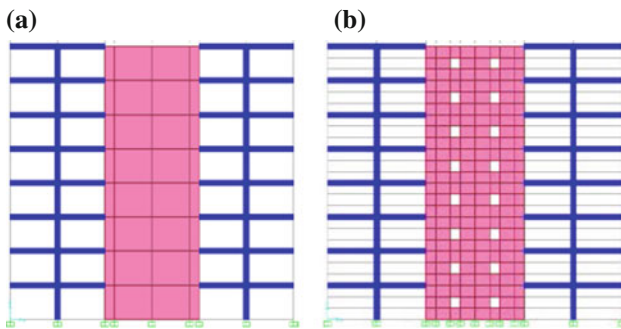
Frame A–A of a solid shear wall building and b punched shear wall building
